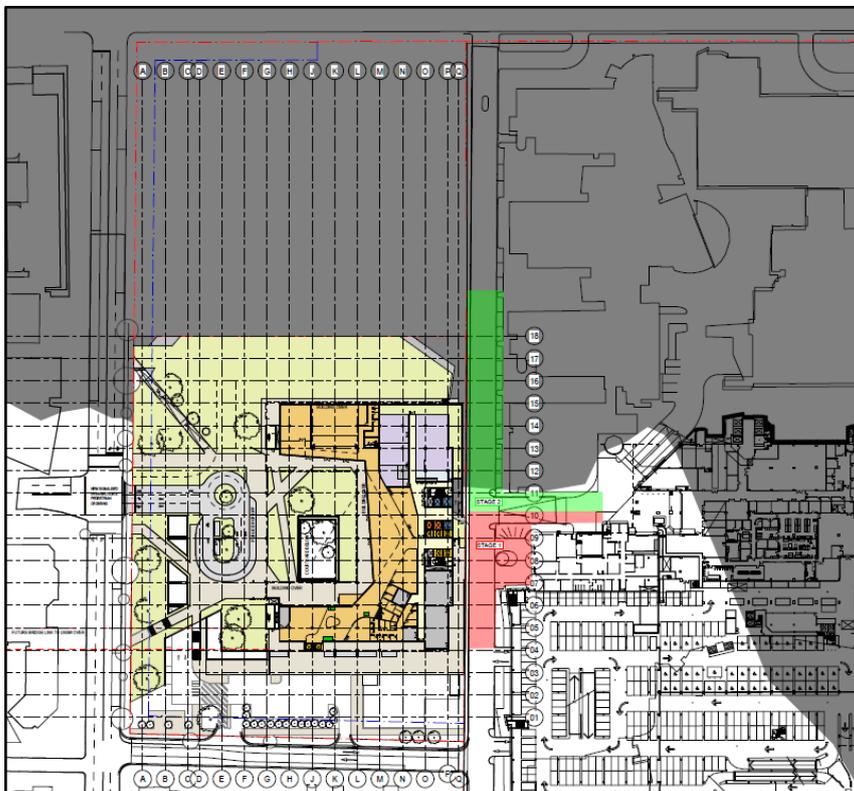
Proposed stages 2 and 3 of construction for Hospital Road lowering
